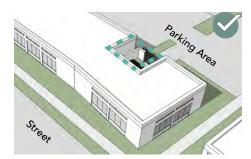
Locate a utility or service area to minimize visual impacts to the street and sidewalk.
